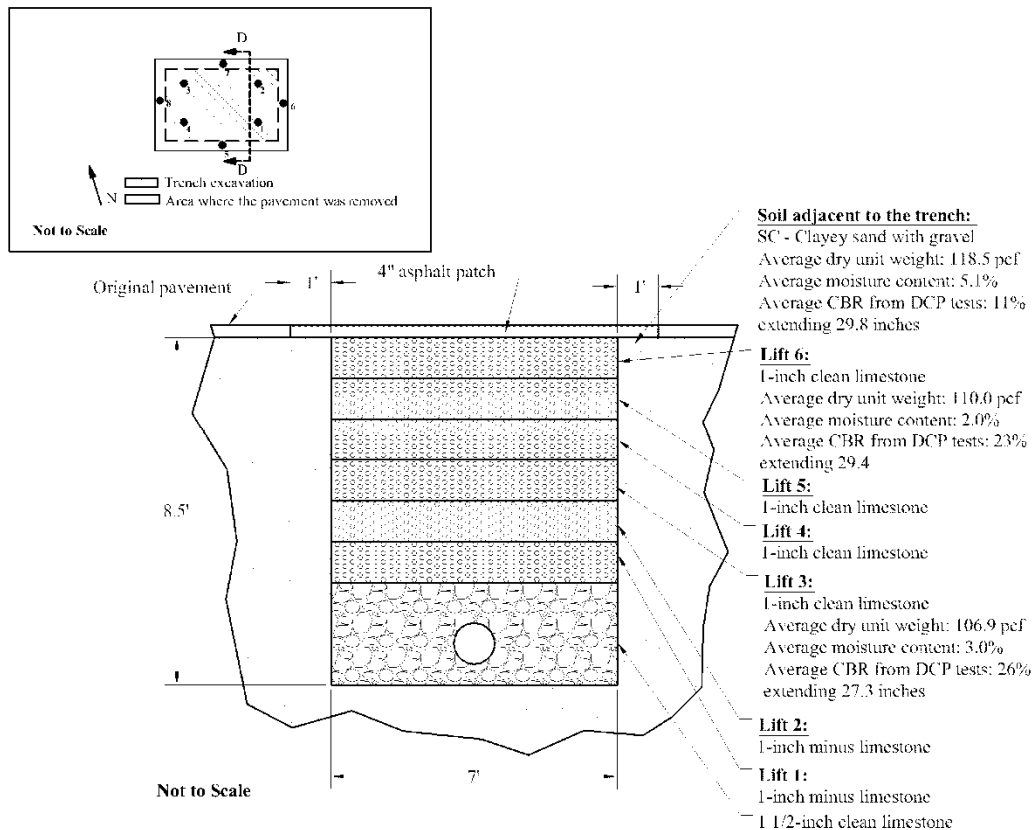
Cross-section D-D of Trench D; (a) plan view, (b) cross-section
